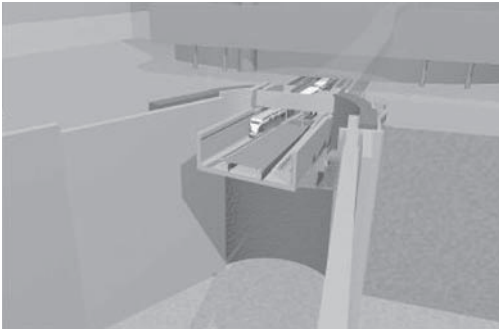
Cross-section of the old station, diaphragm walls and frozen soil for the new station.
